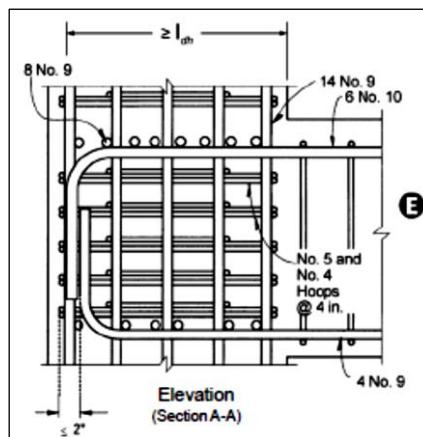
Exterior detailing joint (Moehle et al., 2008)
